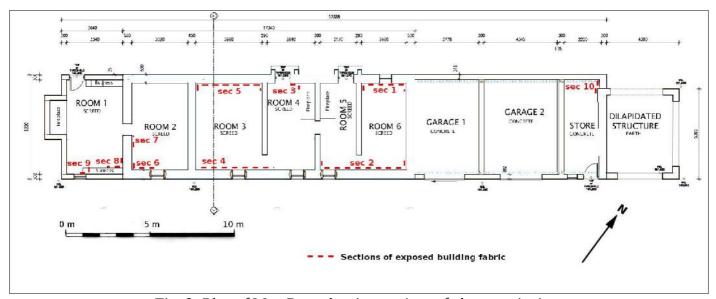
Plan of West Barn showing sections of plaster stripping.
